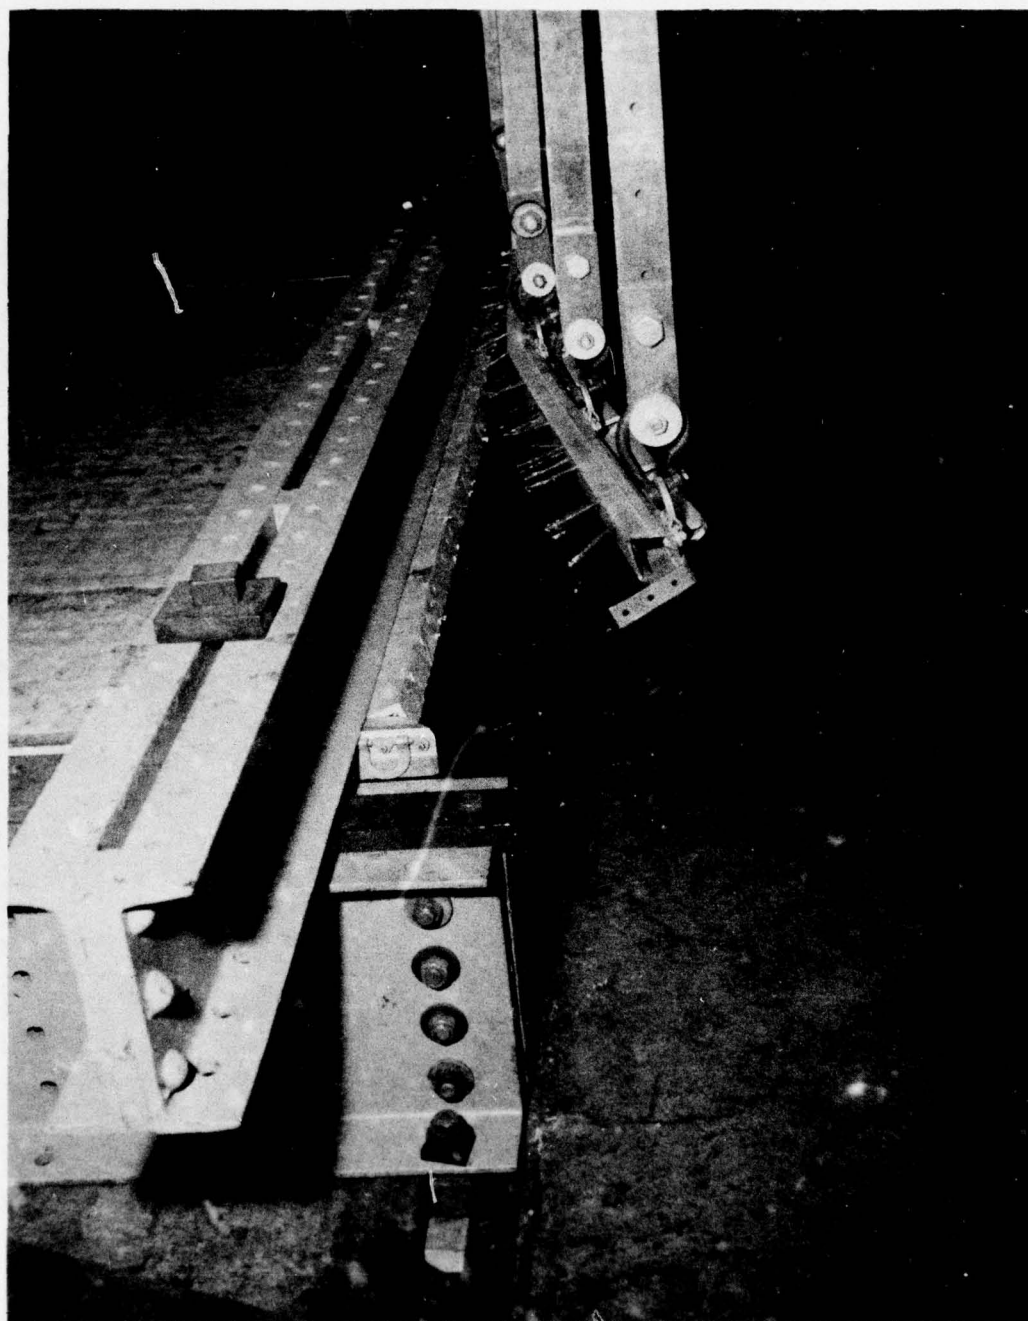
RAIL STRENGTH VERTICAL TEST - BOLT PULLOUT -
